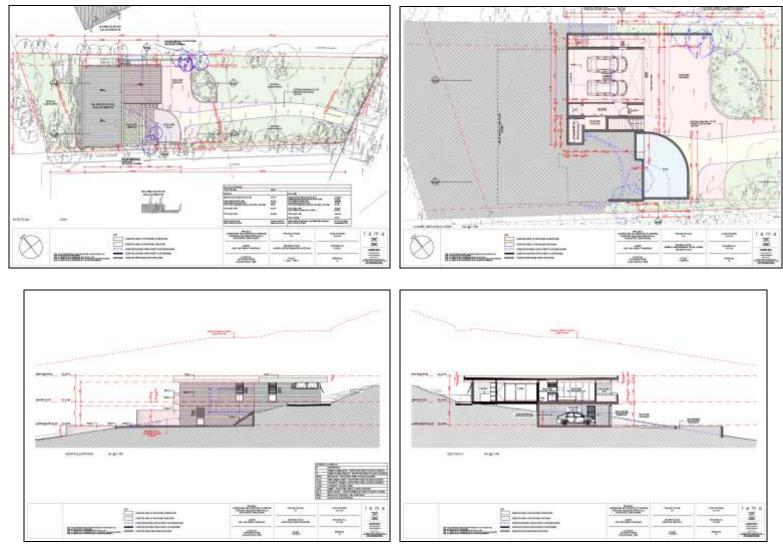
Previous page is Site Survey, above is Draft Concept Plans, Elevation & Section close to where discussed vegetation is located.
